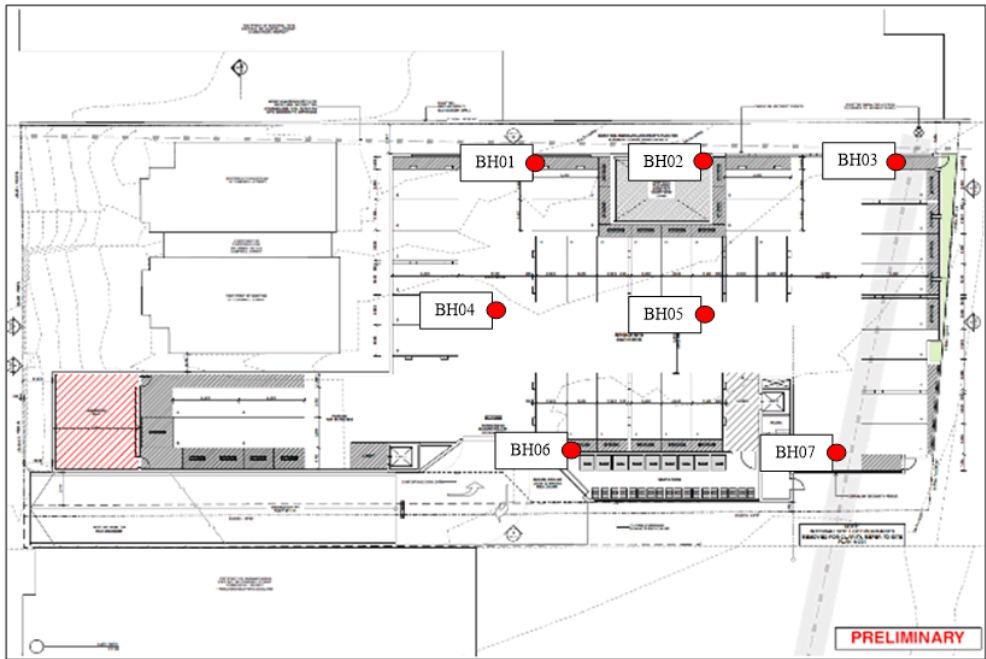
Borehole Plan (Preliminary Architect plans for ground level/basement)
